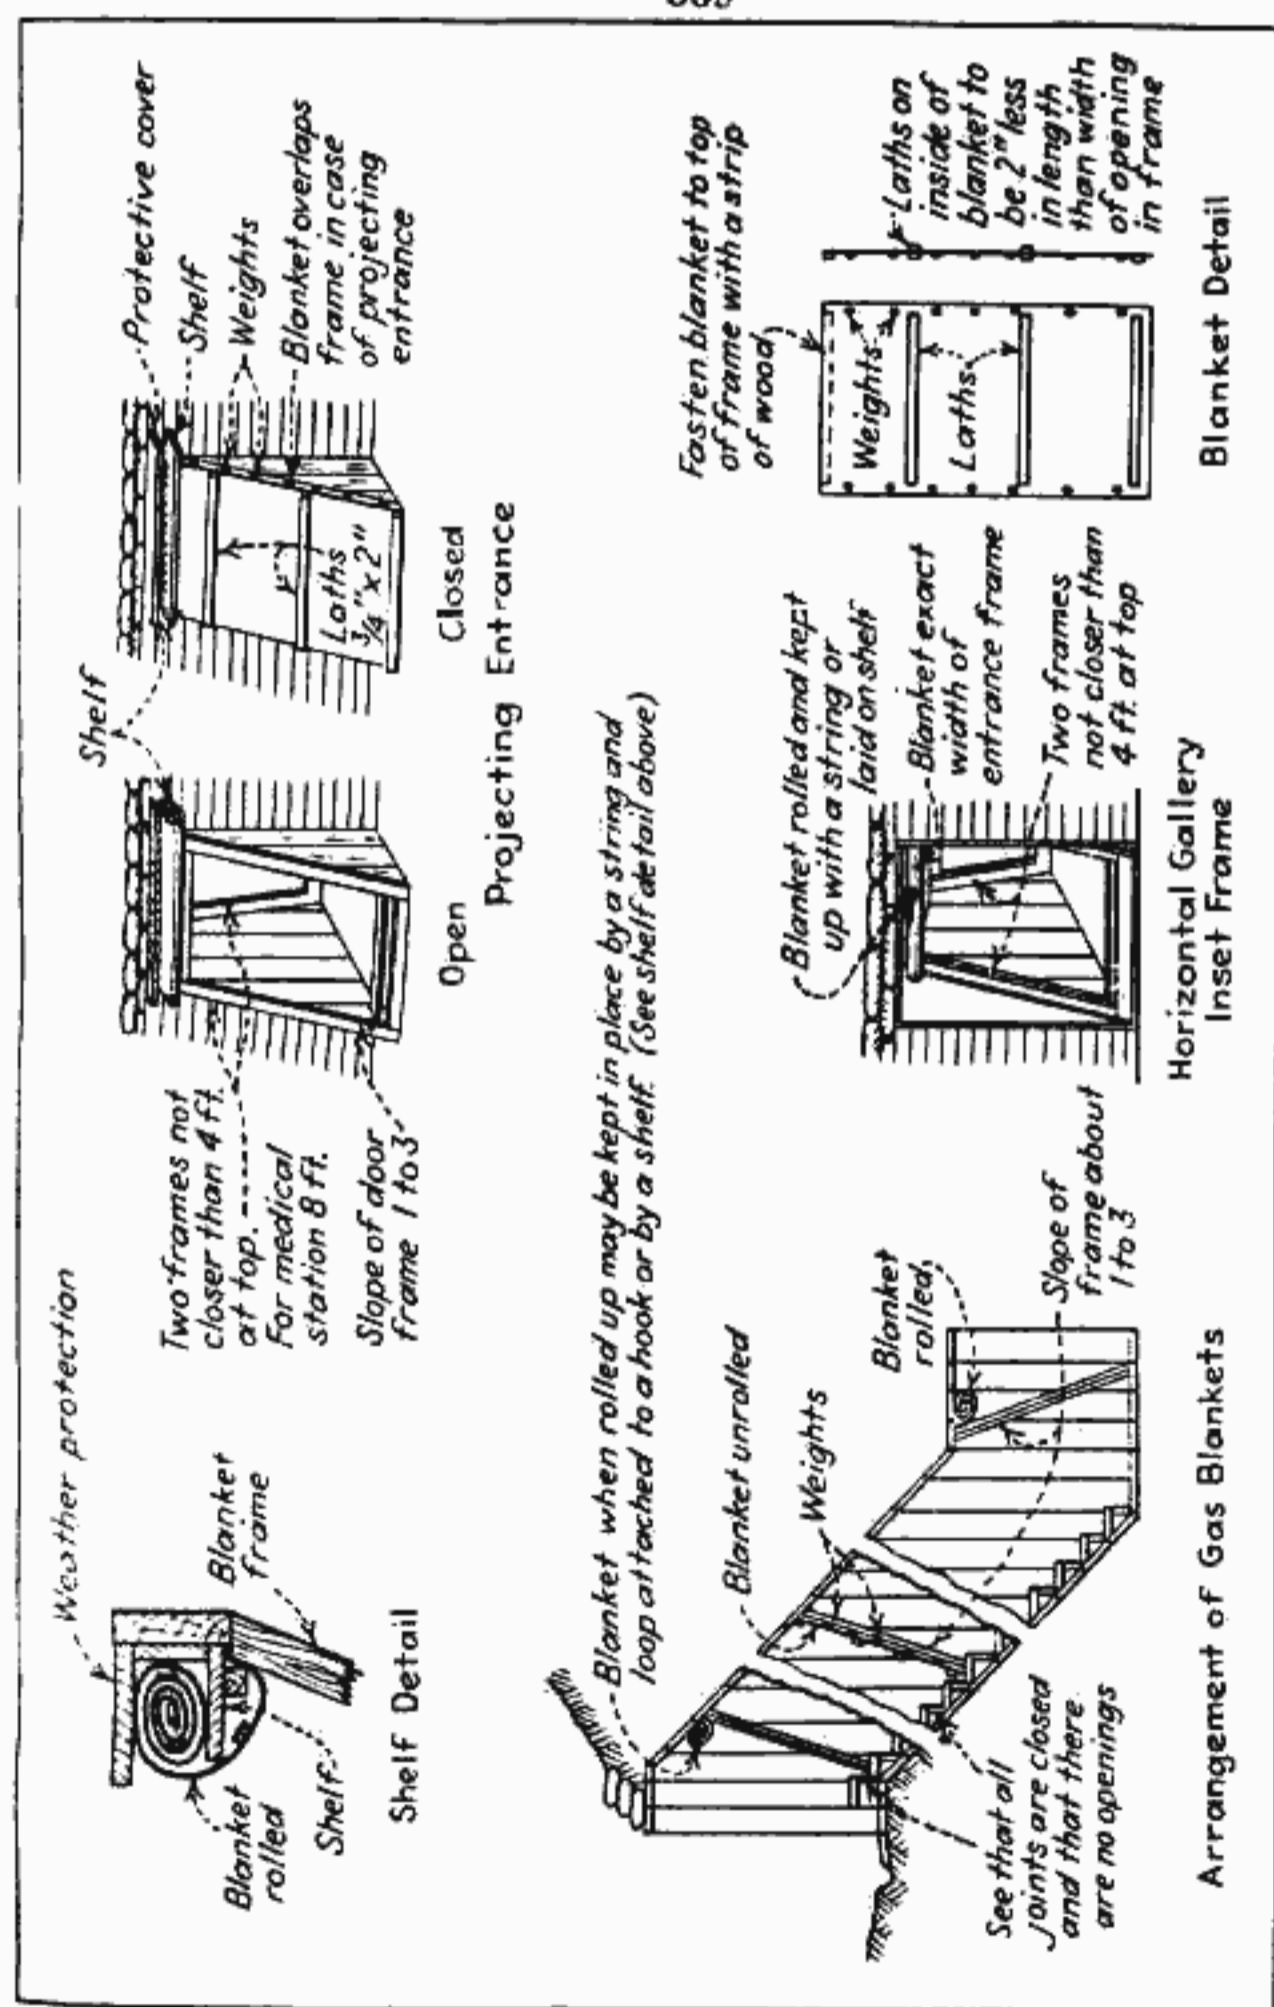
Typical arrangement for gasproofing underground shelters.
